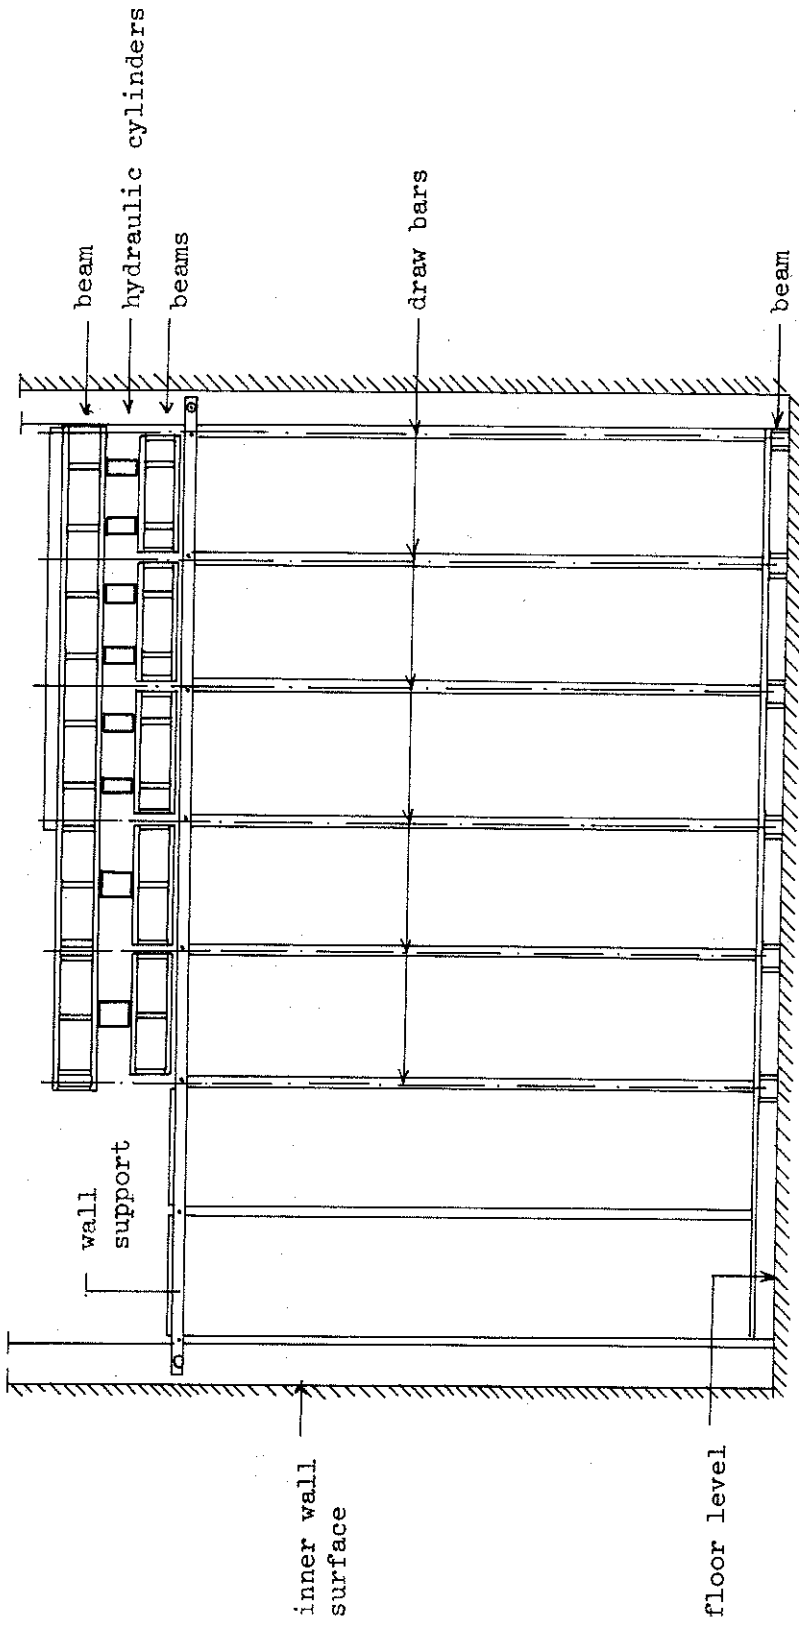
Test house I, inside south wall with hydraulic loading arrangements. Scale 1:30
